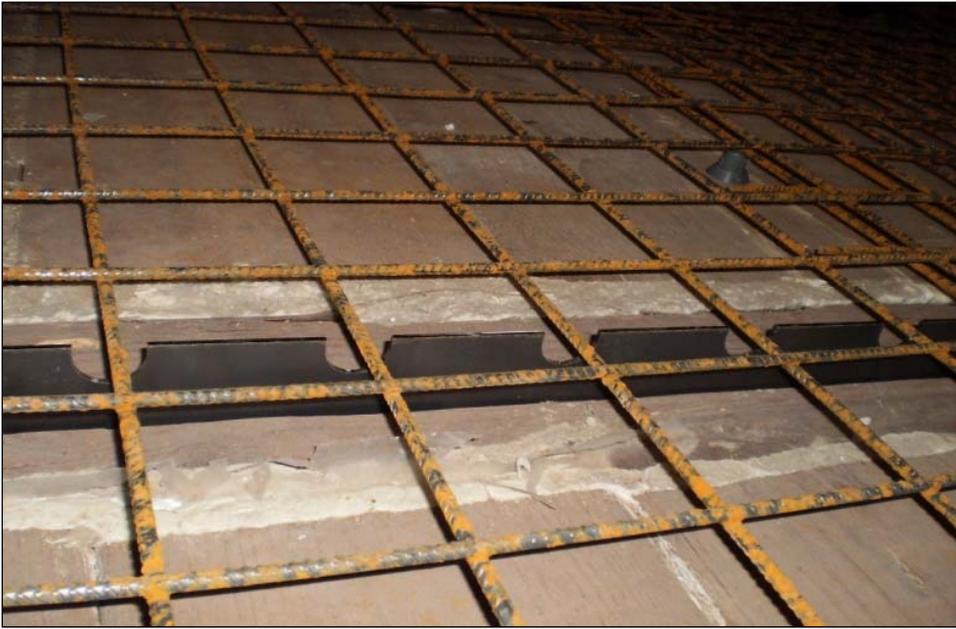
Detailed fitting of shear connector and reinforcement mesh
